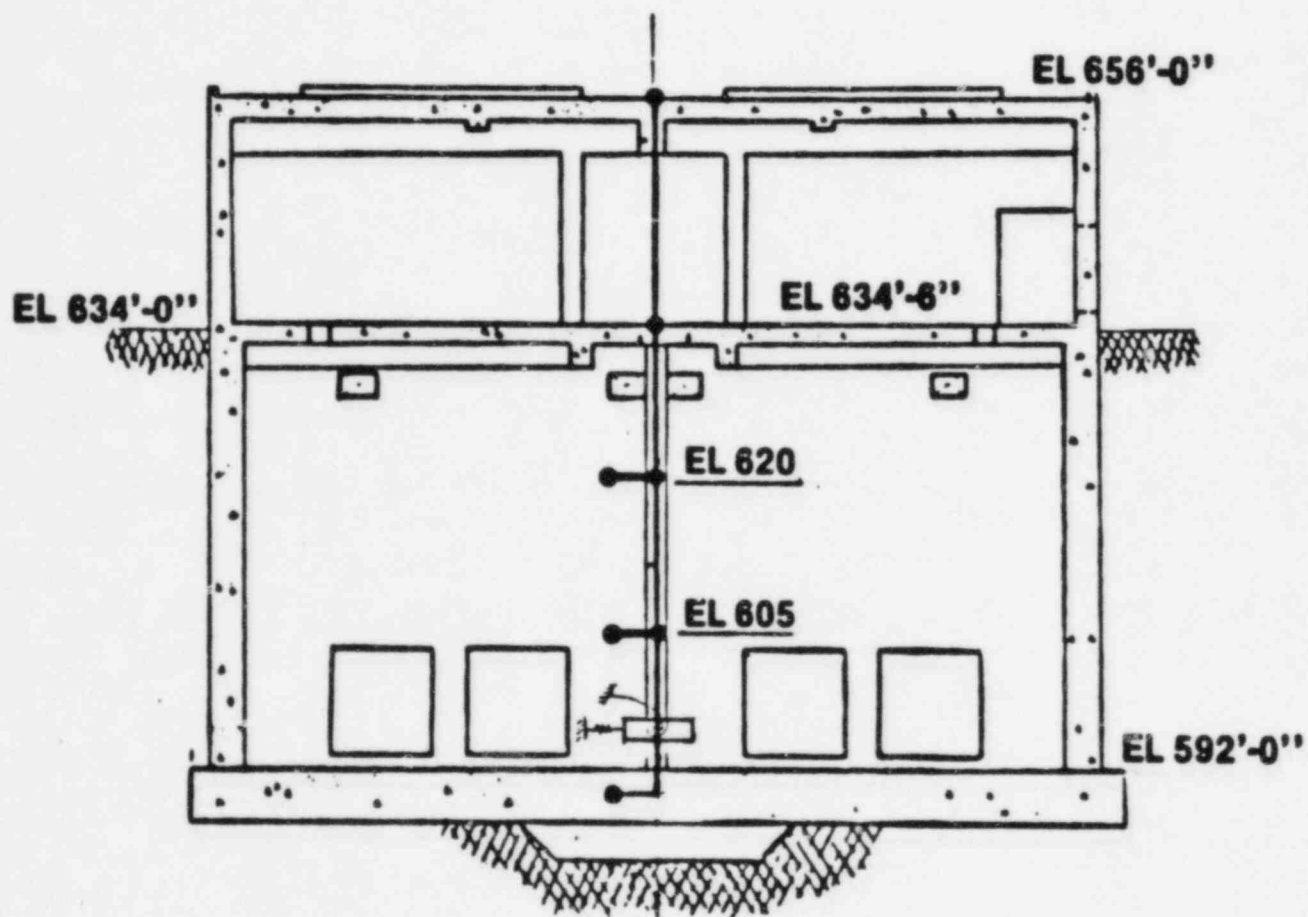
SERVICE WATER PUMP STRUCTURE EAST-WEST SECTION
